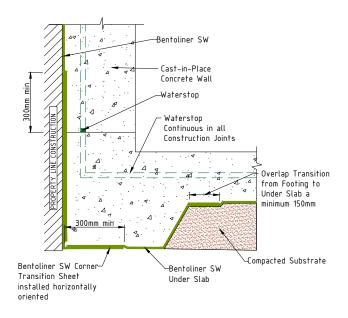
Flush slab detail property line wall at hydrostatic condition
